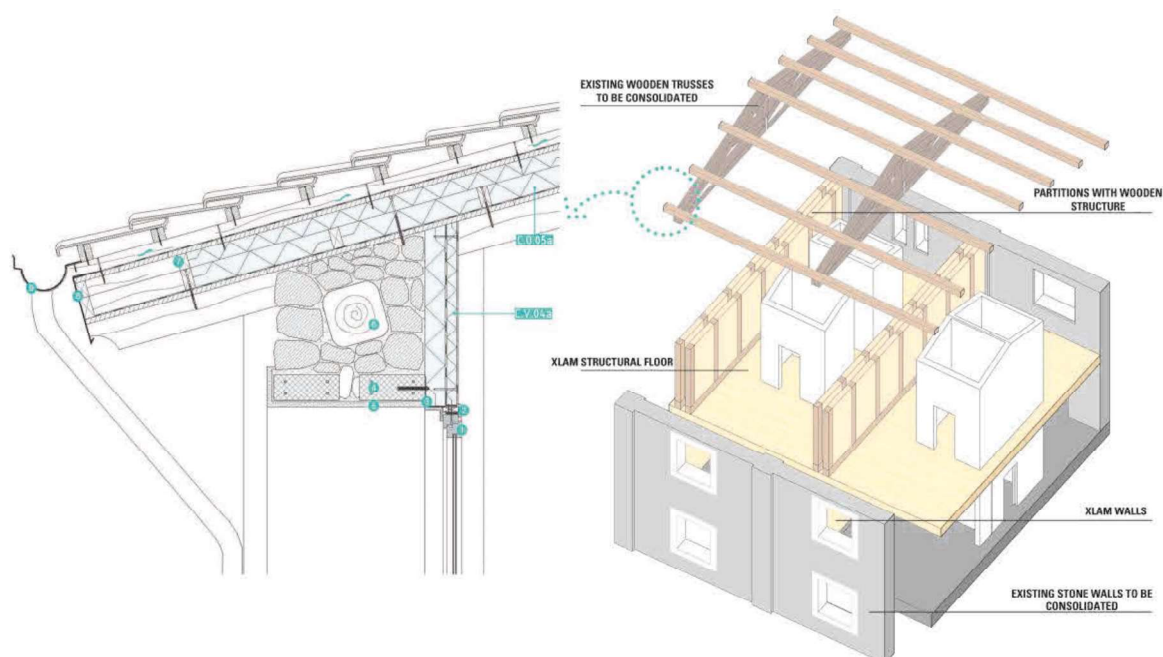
Technical detail of roof intervention - Exploded axonometry of the intervention with Xlam technology for box in the box strategy; source: F. Speciale, A. Fassi, R[A]ISING SPLUGA
